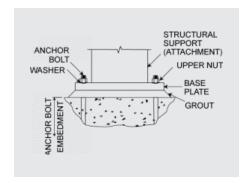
Typical single-nut connection (Figure C5.16-2\*).
